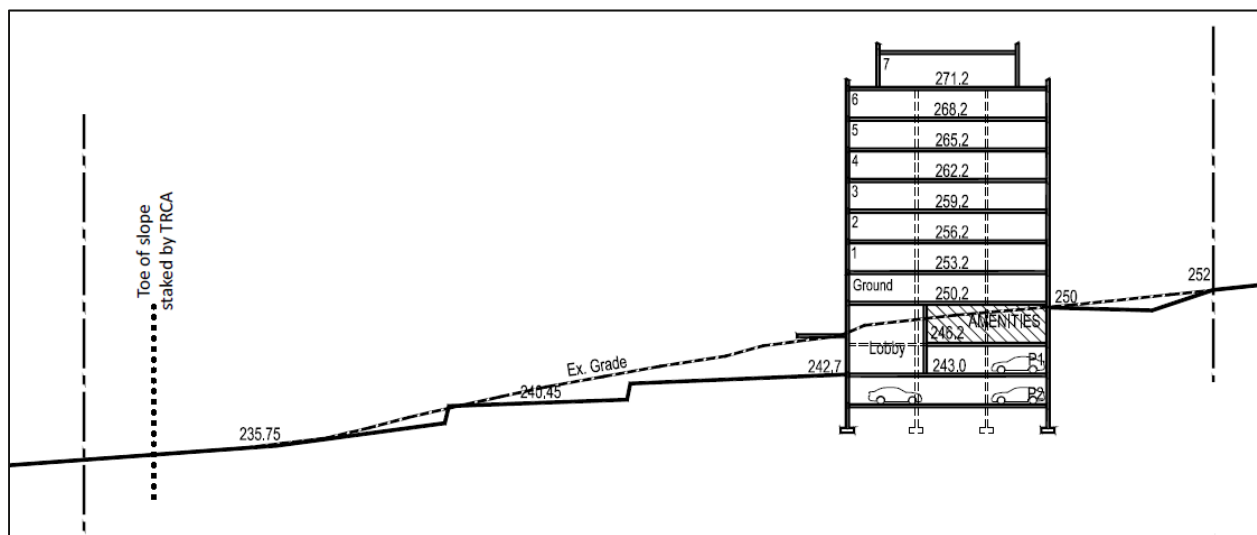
Conceptual Building Elevation within the Valley Cross-Section
